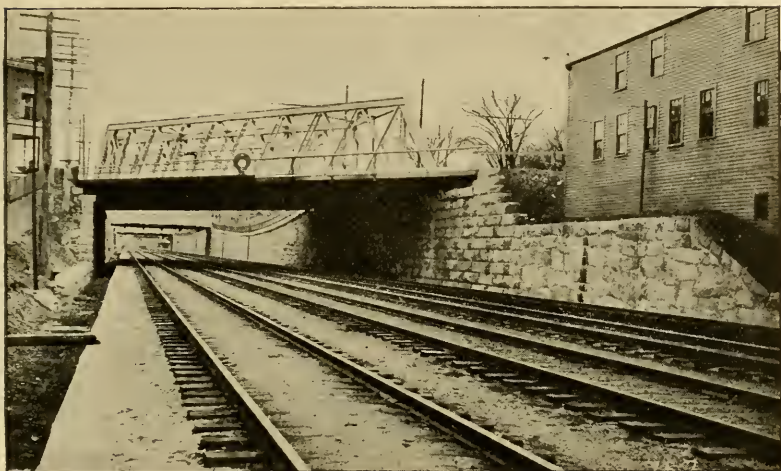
FINISHED WORK FROM WASHINGTON STREET, WEST NEWTON,
